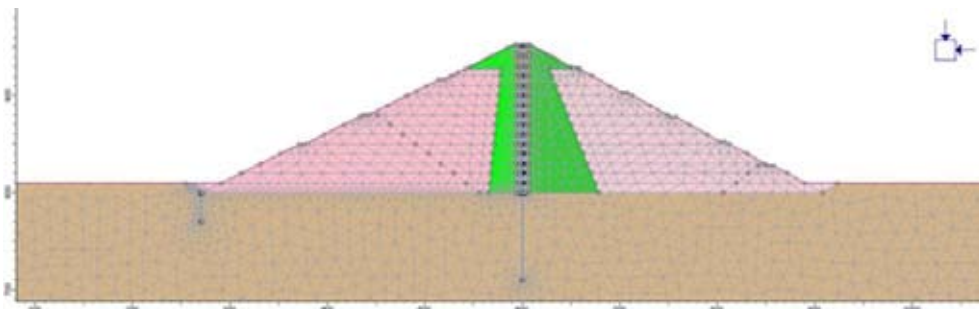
Geometry of FEM model – End of Construction of the Dam - Stage 25
